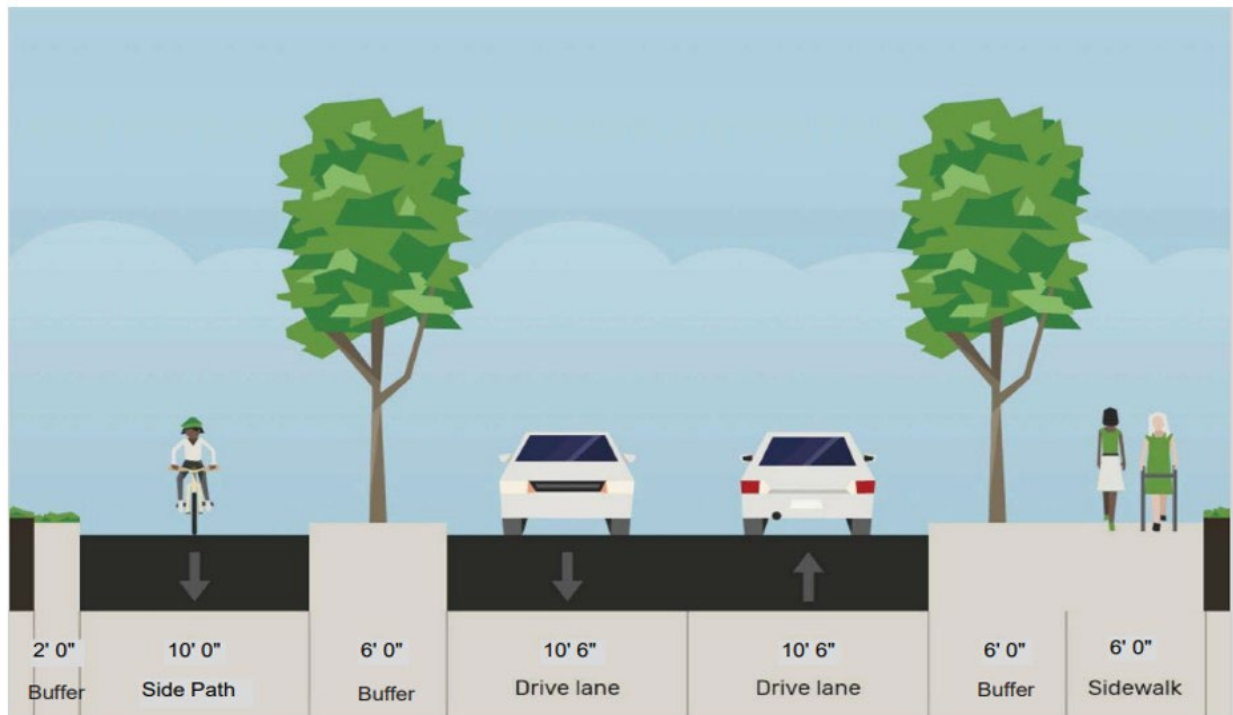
Typical Cross Section for Crabbs Branch Way Extension
